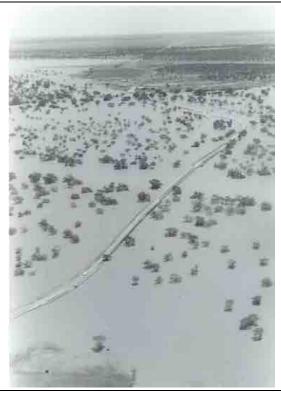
Overlooking bridge crossing at Polygonums Swamp. (*Source: Council*)
